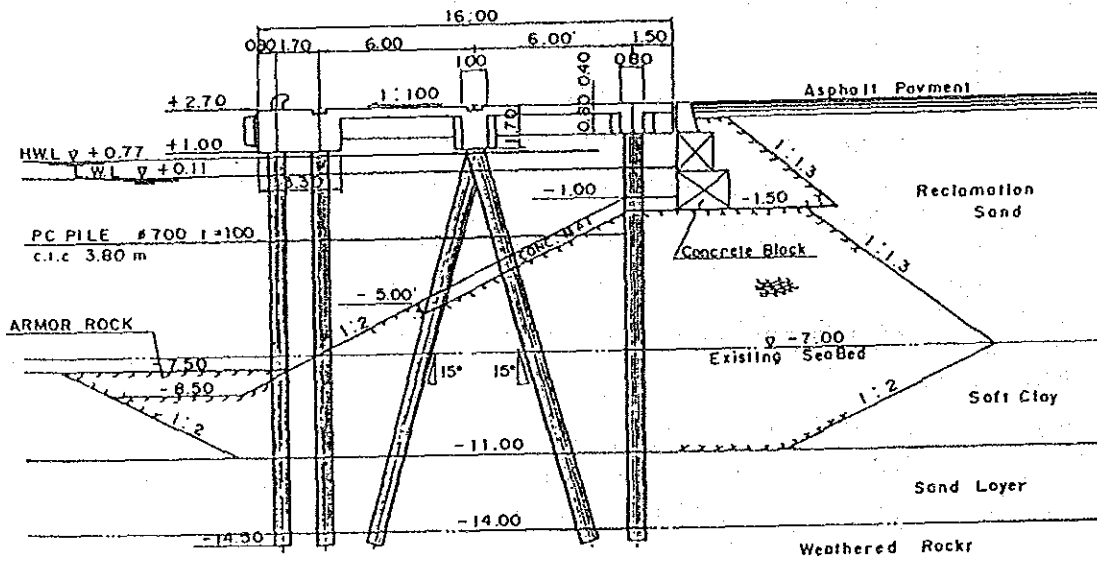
Typical Cross Section of North Pier No. 4 Berth
